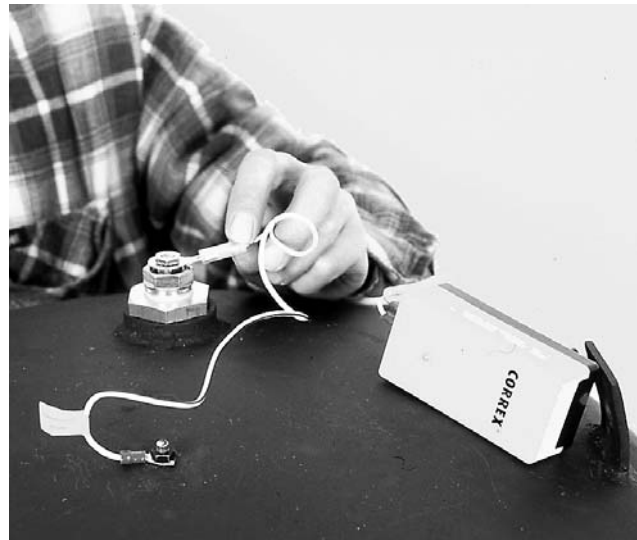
Option: Fasten a cable from the electronics device to the grounding screw and attach the other end to the electrode.
